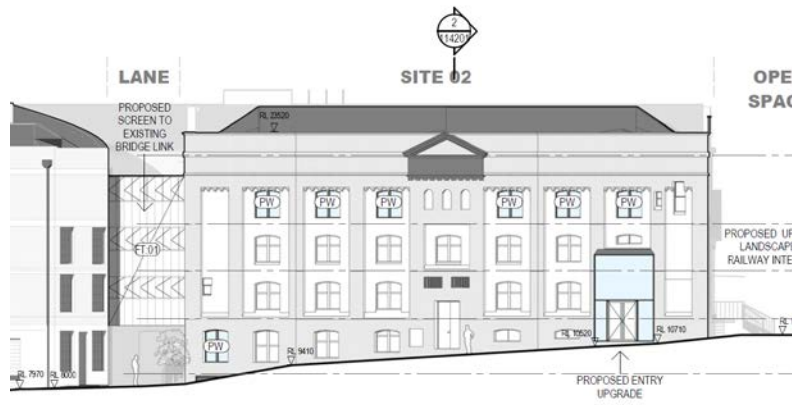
, extract from Woods Bagot TP drawing set showing proposed new windows to the north facade.
